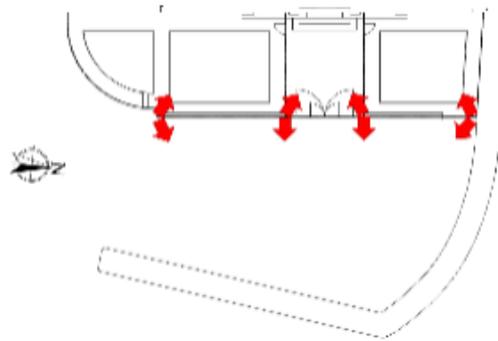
Garden and opposite area of the Church – position of the Luminaires
